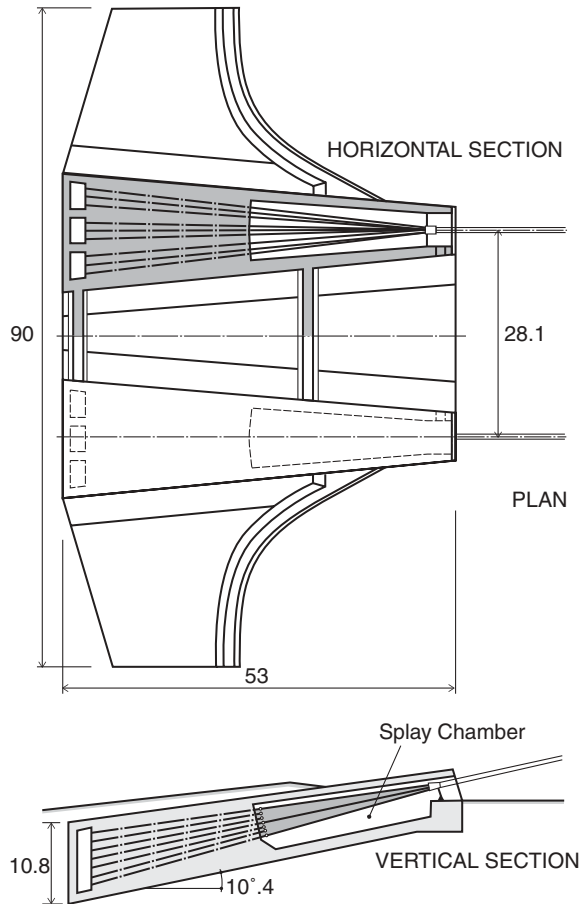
Splay chamber in the anchor block of the Storebælt East Bridge prior to cable erection
